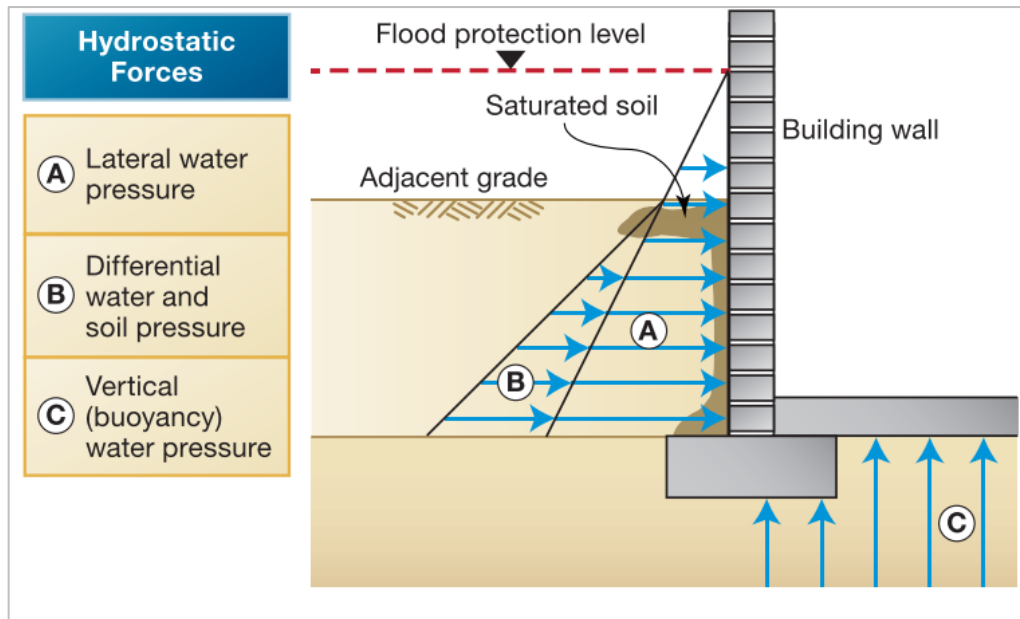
Hydrostatic forces (Source; [Protecting Building Utility Systems from Flood Damage](#))
